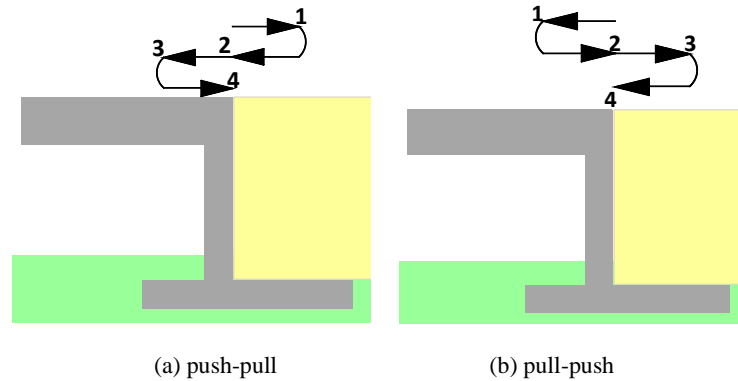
(a) loading 1: the abutment first pushes (ps) the backfill soil and (b) loading 2, the abutment first pulls (pl) the backfill soil.
